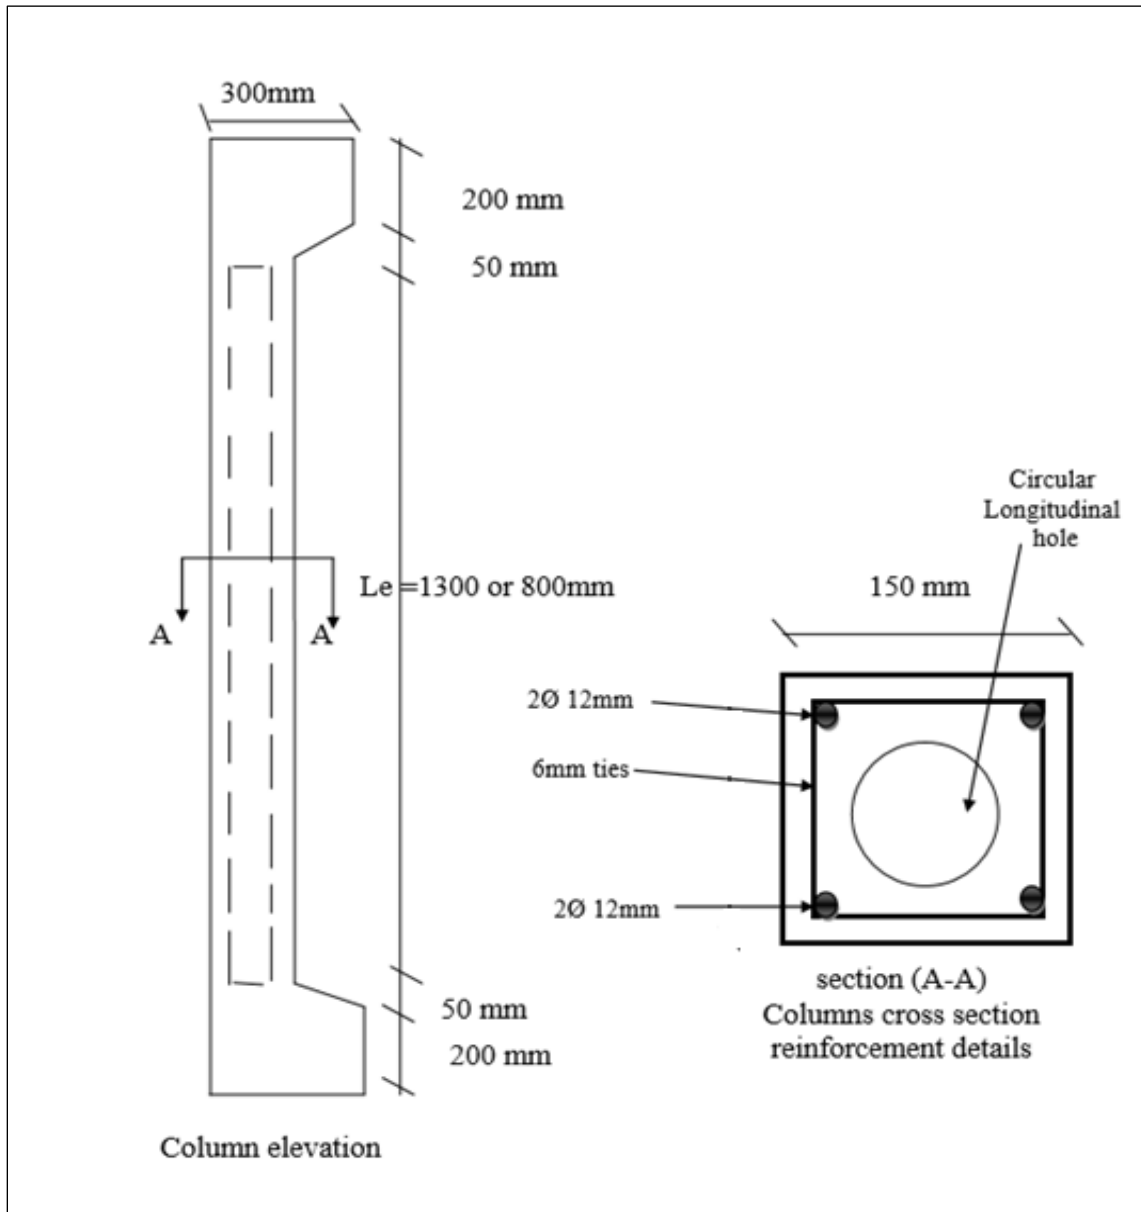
Column elevation and cross section (Ihsan et al., 2018).
